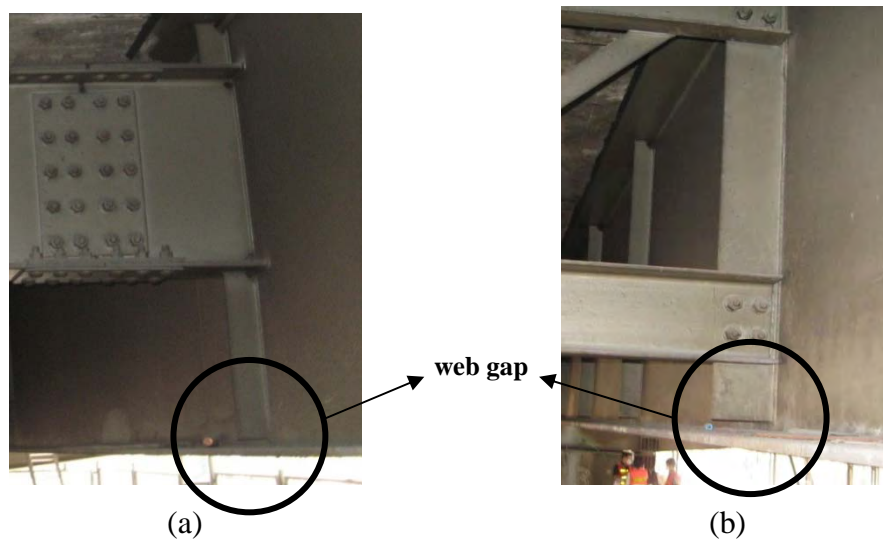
Web-gap on web girder of Wongsawan bridge (a) at diaphragm
